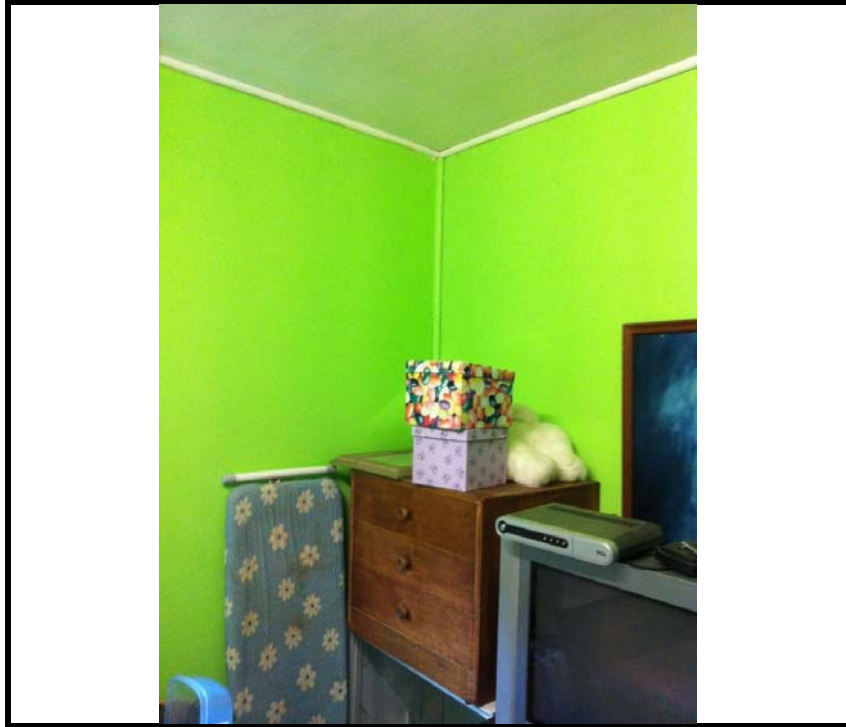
16 Bowditch Avenue – ACM sheeting lining wall and ceiling of enclosed back verandah of the house.
